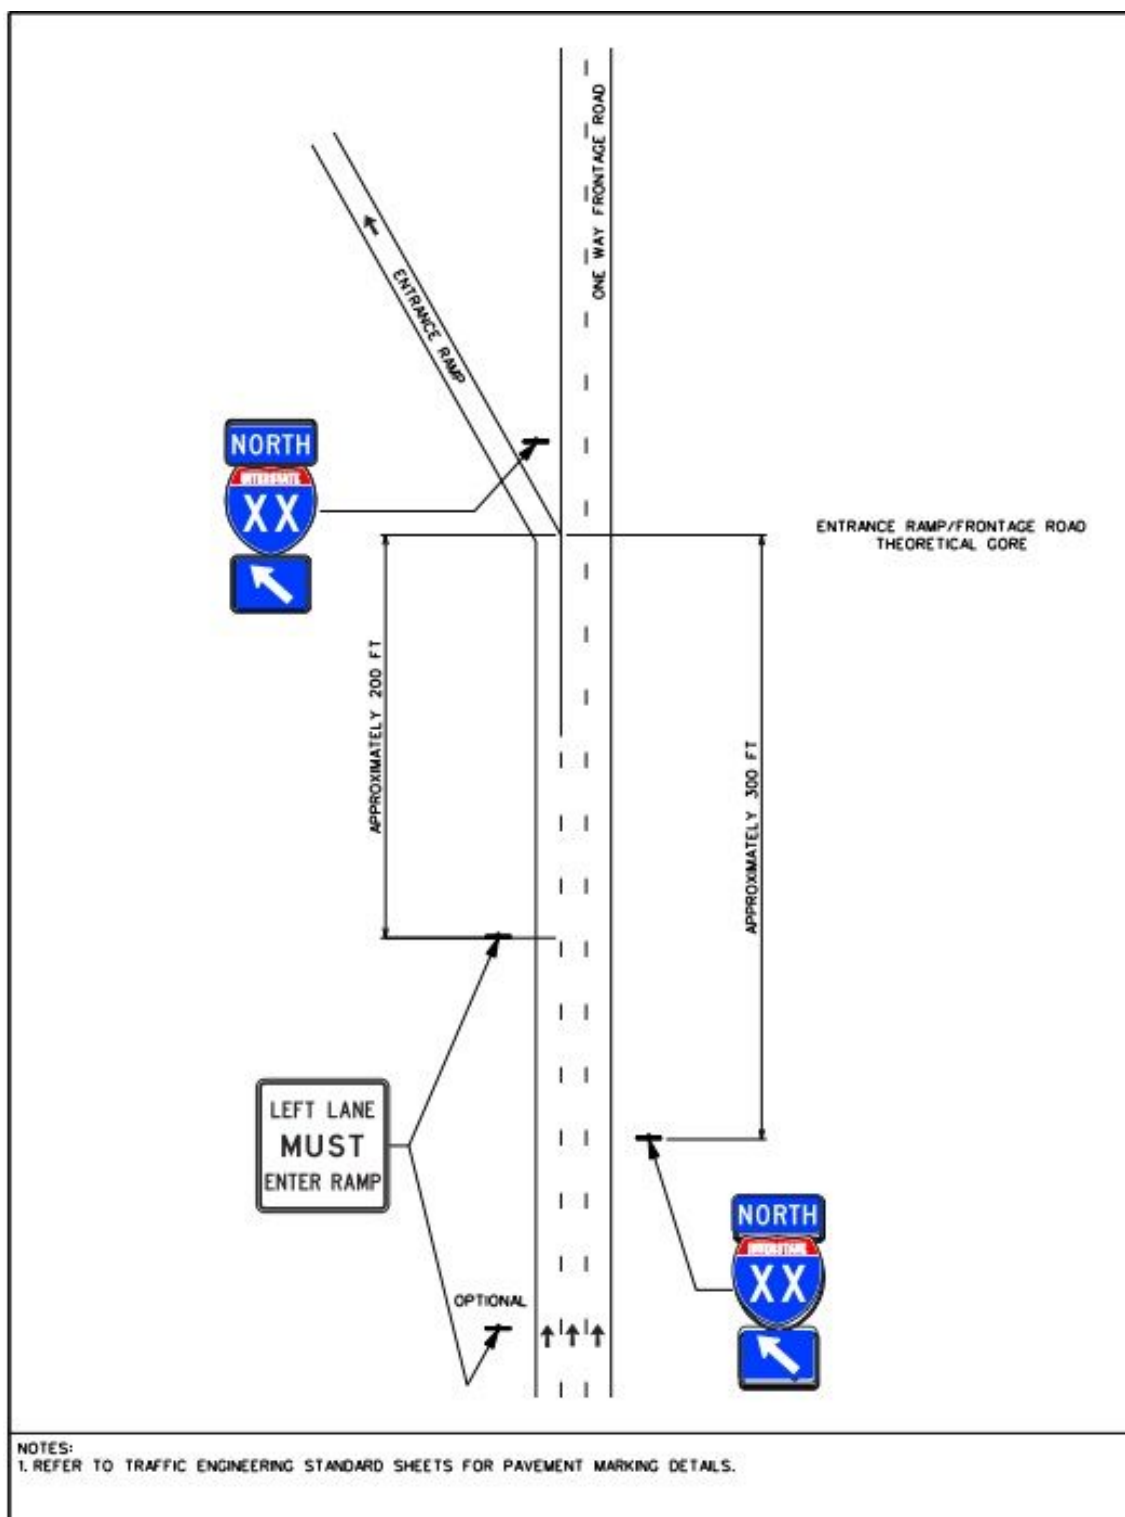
Typical signing for an entrance ramp from a one-way frontage road – lane-drop condition.
